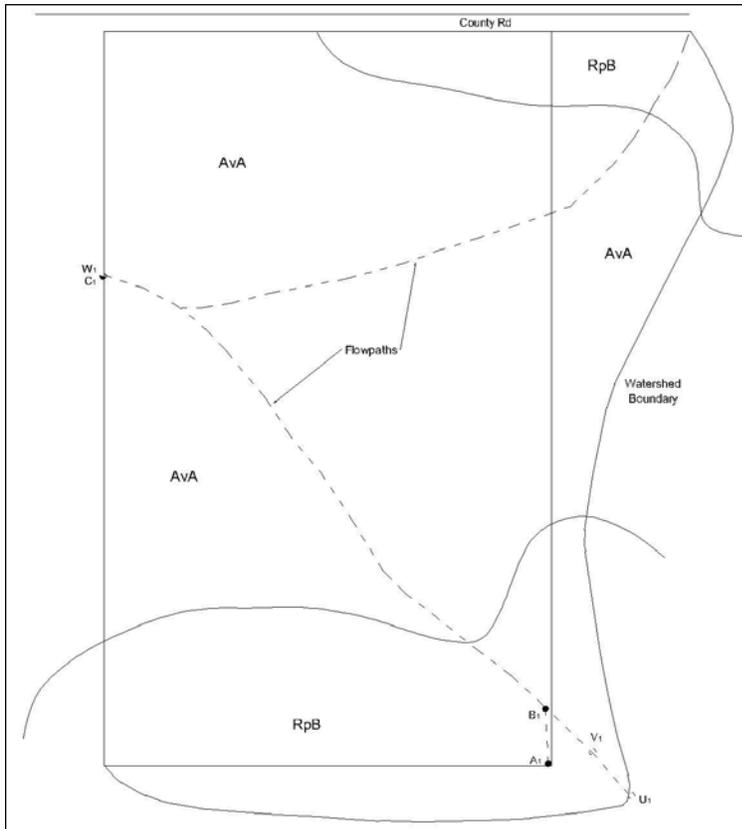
B.1. Autumn Knoll Subdivision Site Plan.
